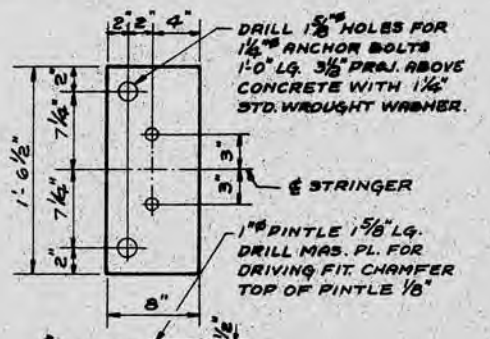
PLATE LUBR. BRONZE PL. TOP PART BEARING "A"
